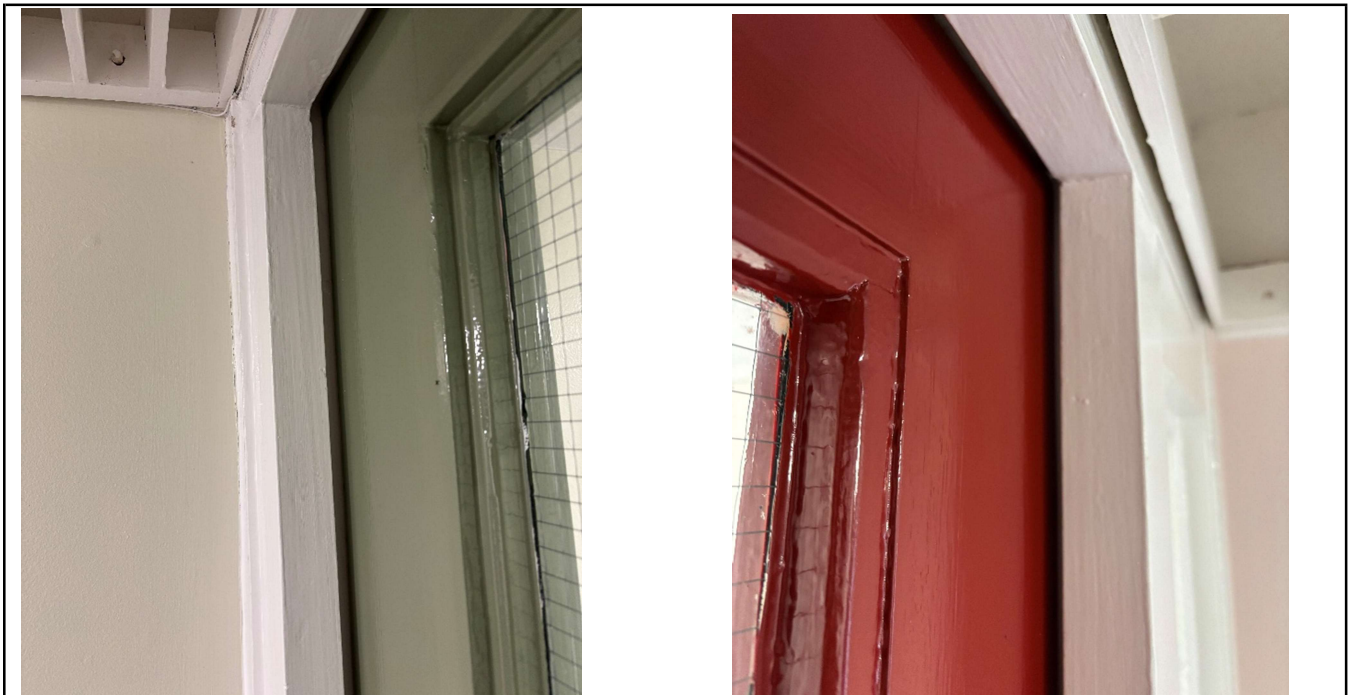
Examples of doors not fully closing into frames listed in 12.1
